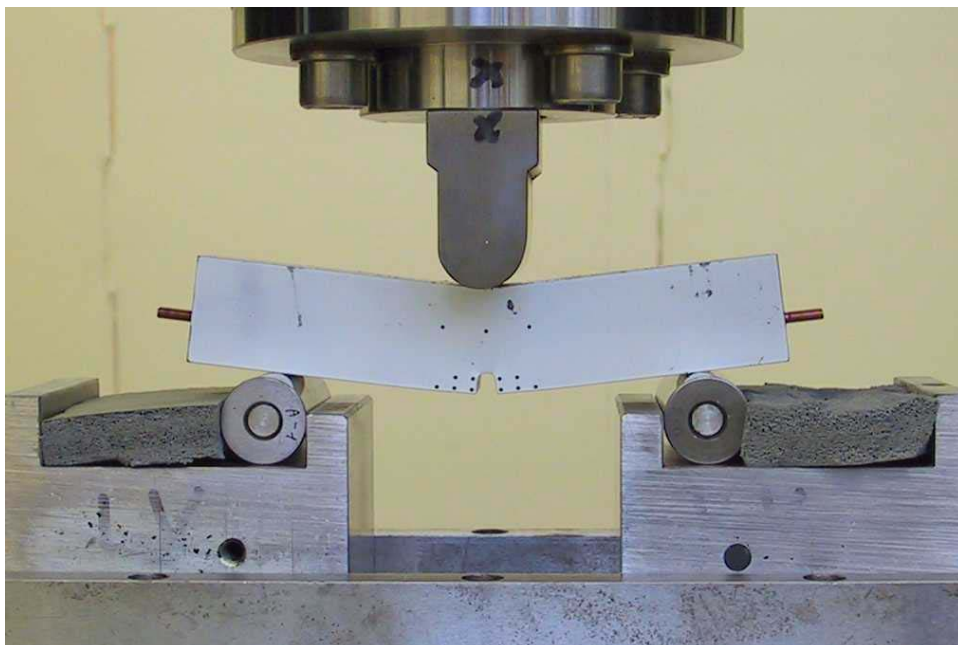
Testing machine (EMPA) with a bending specimen
